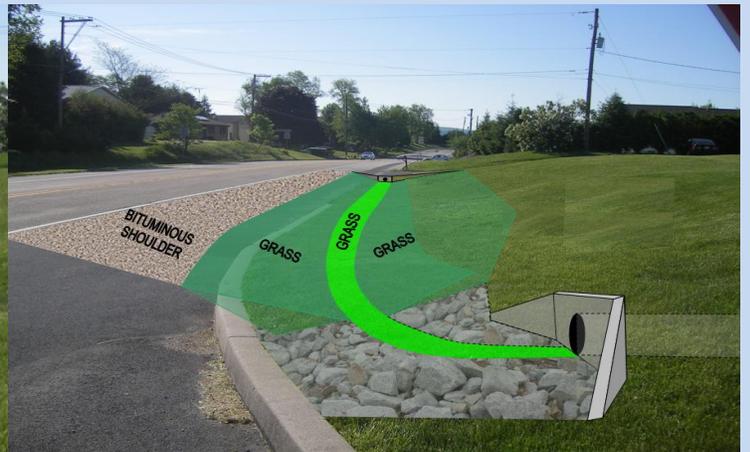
Alternative installation that utilizes an open surface channel
